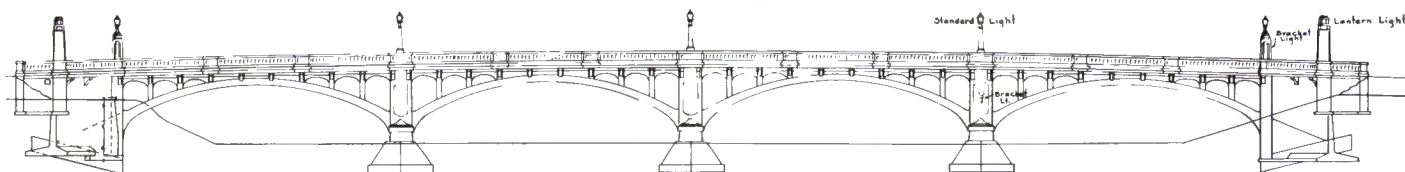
Capitol Boulevard Memorial Bridge. Elevation looking upstream.
